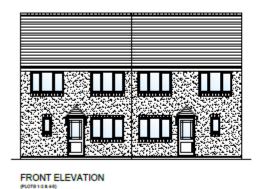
Extract from proposed front elevation that reflects the roof form of adjacent properties.
